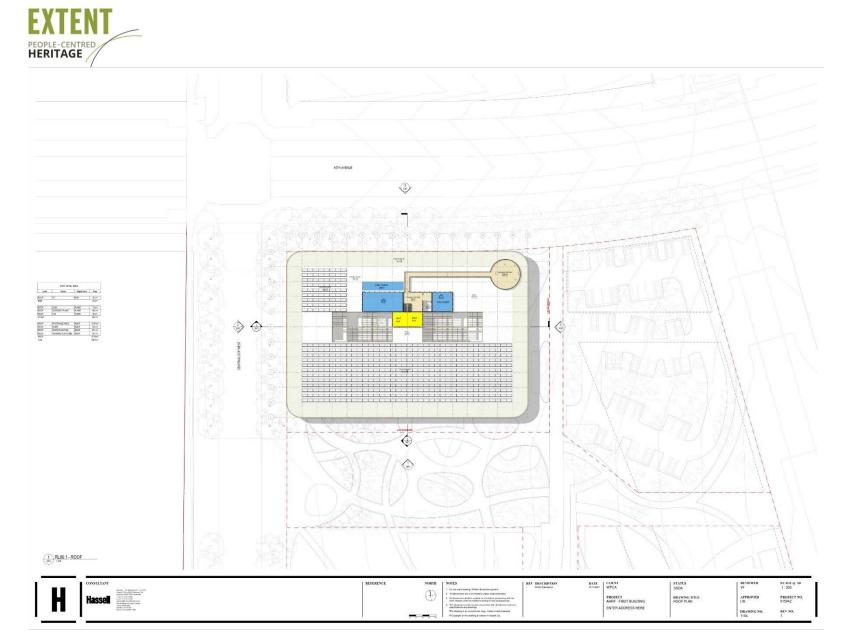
AMRF – First Building roof plan (Architectural drawings prepared by Hassell, 2021).
